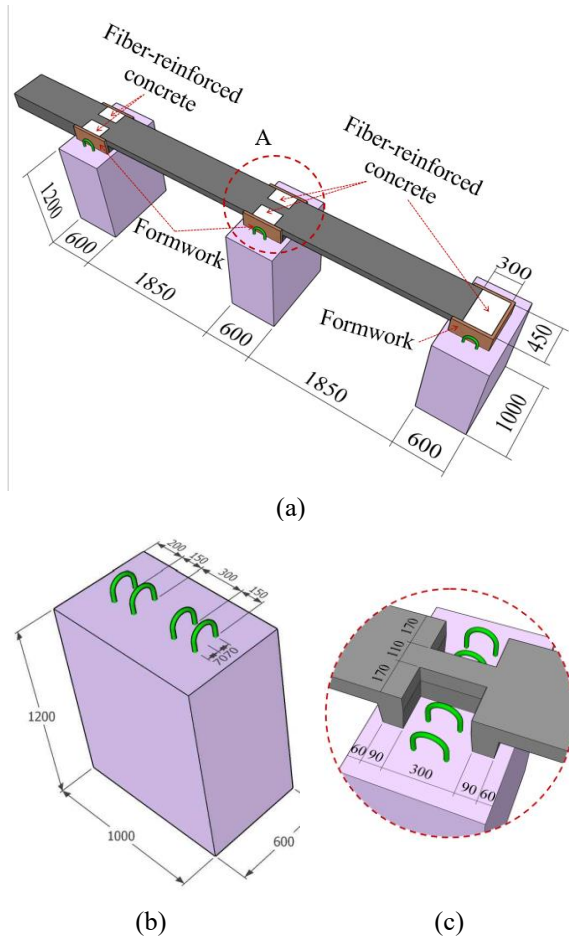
Details of concrete blocks: (a) Placing the HPC specimen on concrete blocks; (b) Details of concrete blocks; (c) Details of A
